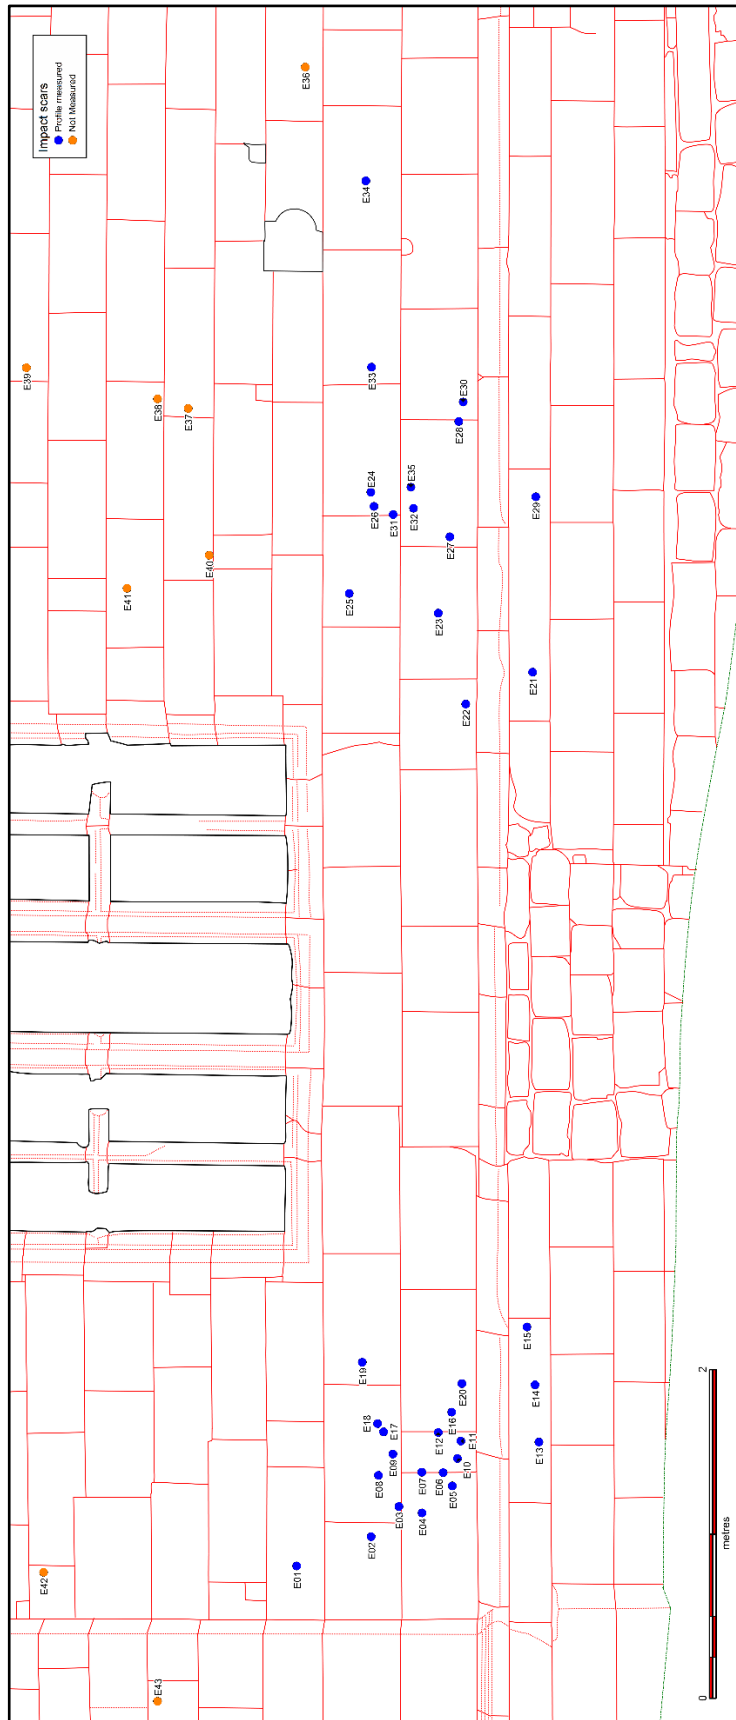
Scar plot elevation of eastern wall of the south range of Moreton Corbet Castle
